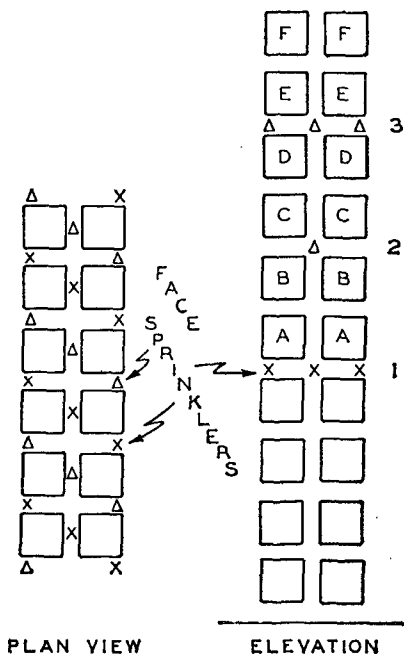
In-Rack Sprinkler Arrangement, Class I Commodity, Height of Storage over 25 Feet
